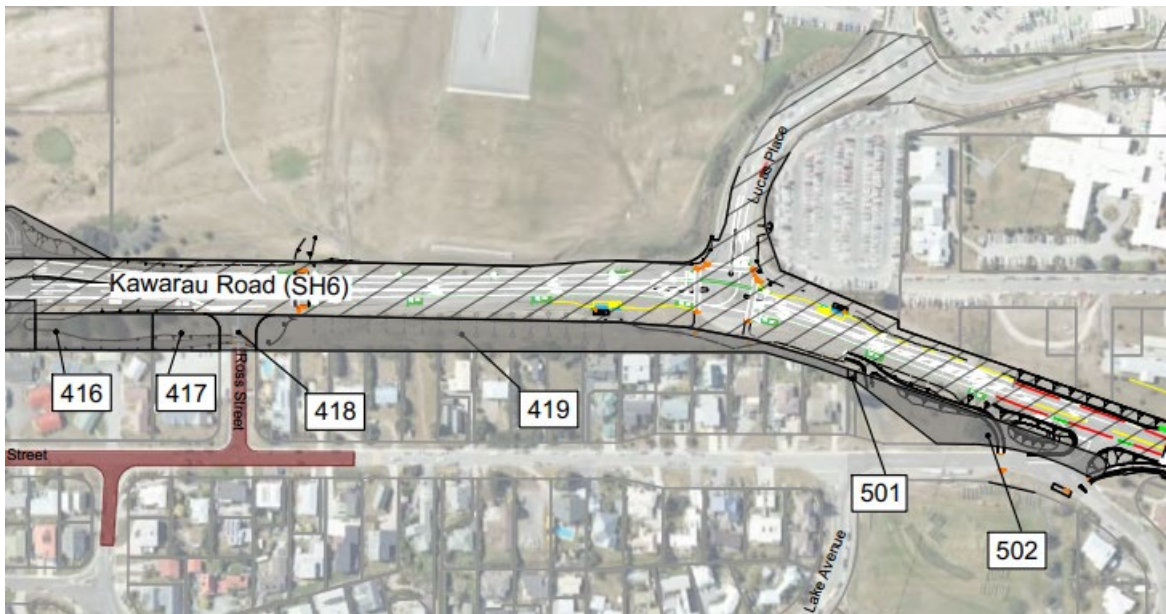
Designation Plan – Grant Road to Hansen Road
